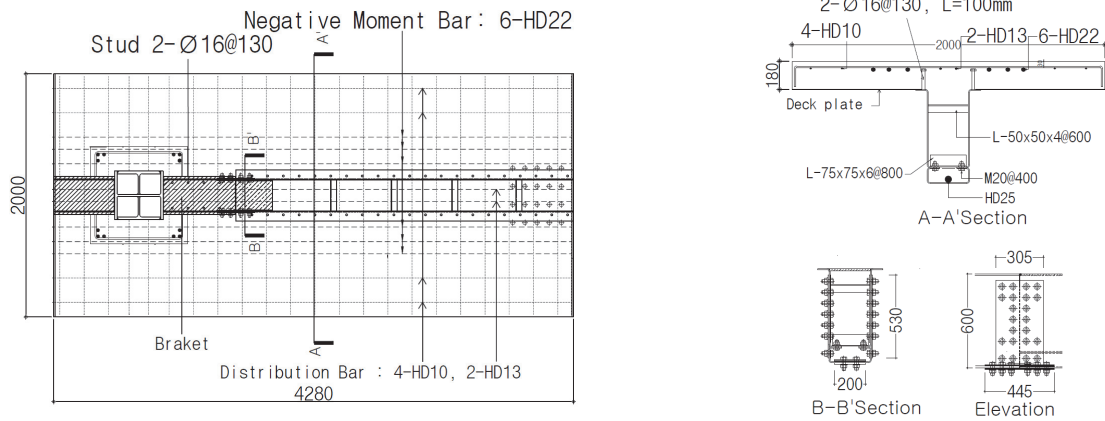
Detail of HF6-S-6 specimens (unit: mm)
